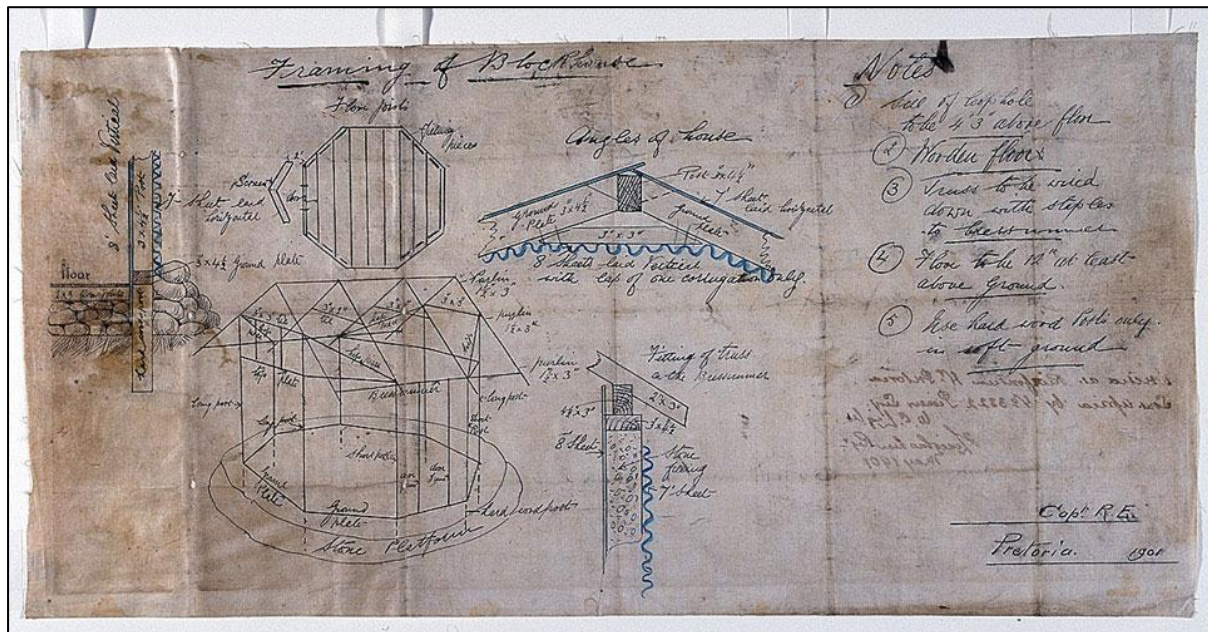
28. Block House building plans (National Army Museum London: NAM. 1963-08-121-1).
